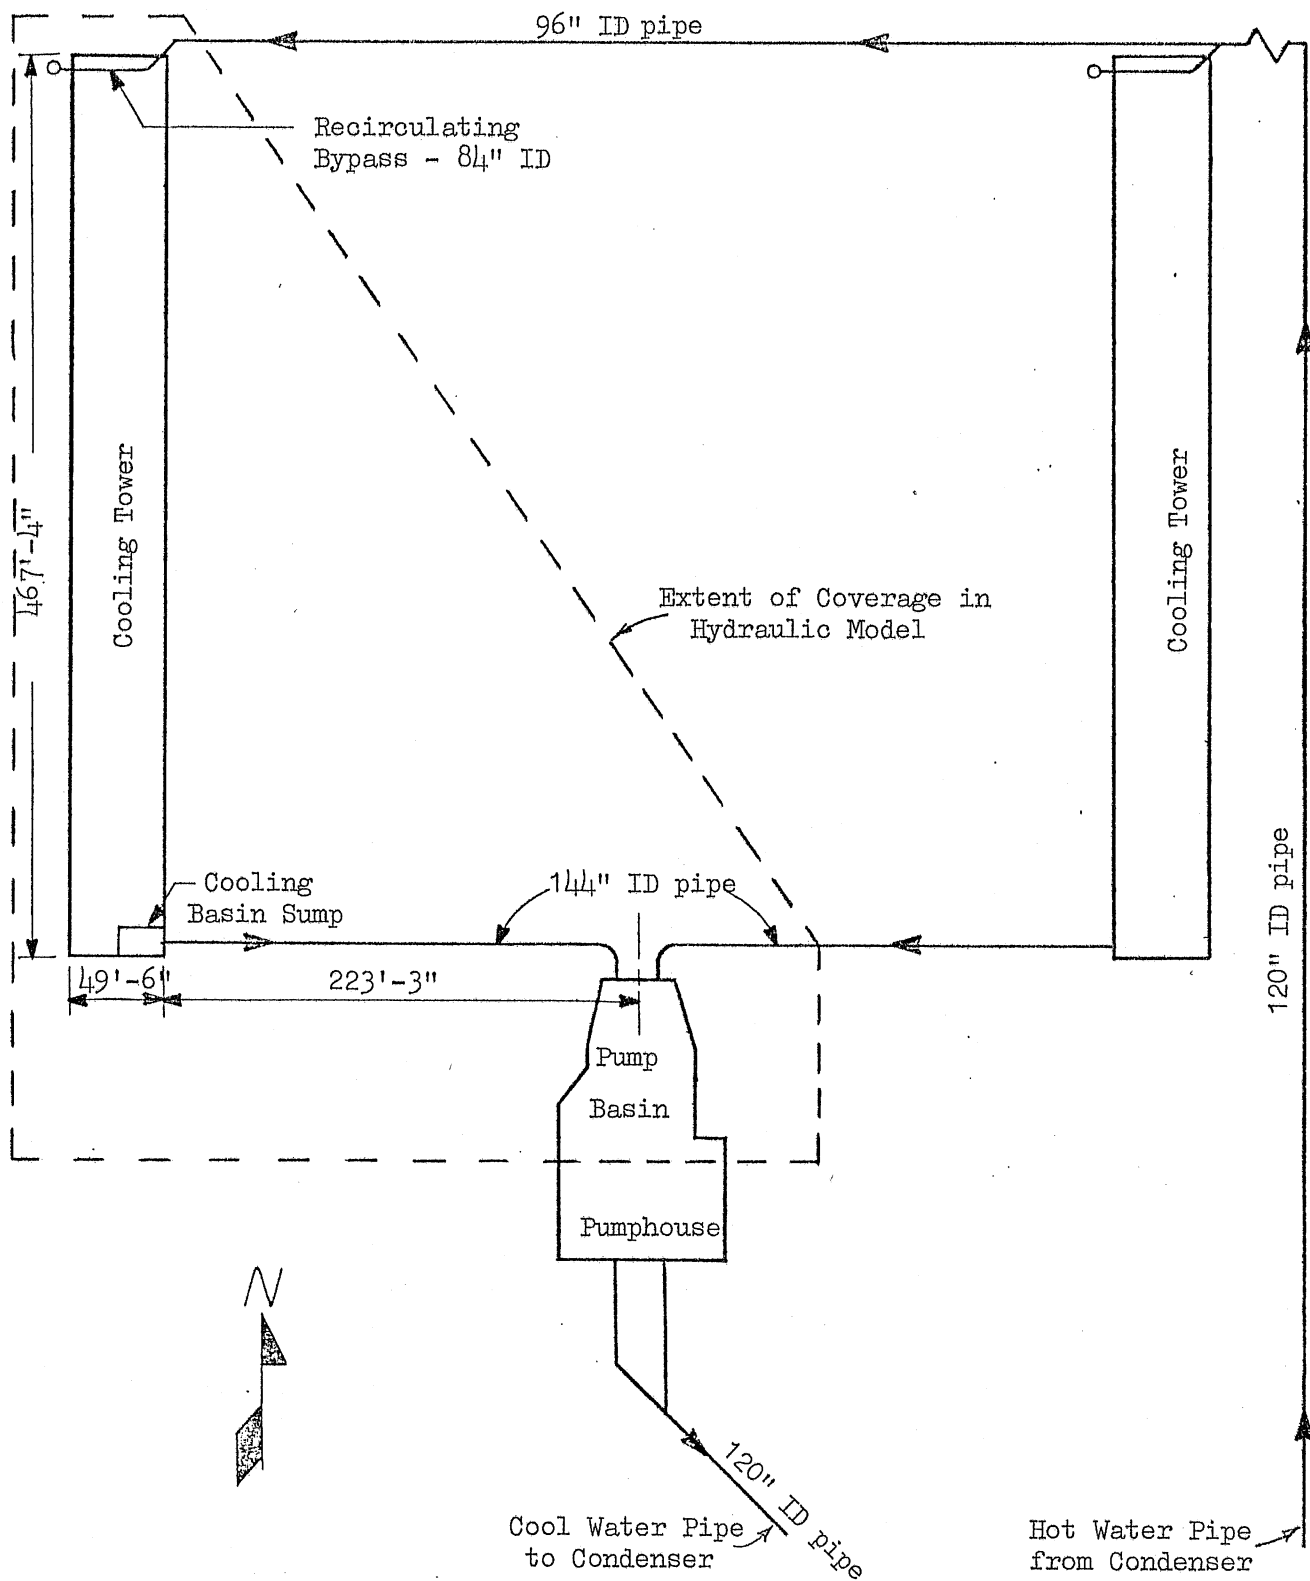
General Plan Layout of One of the Two Cooling Water Systems.
